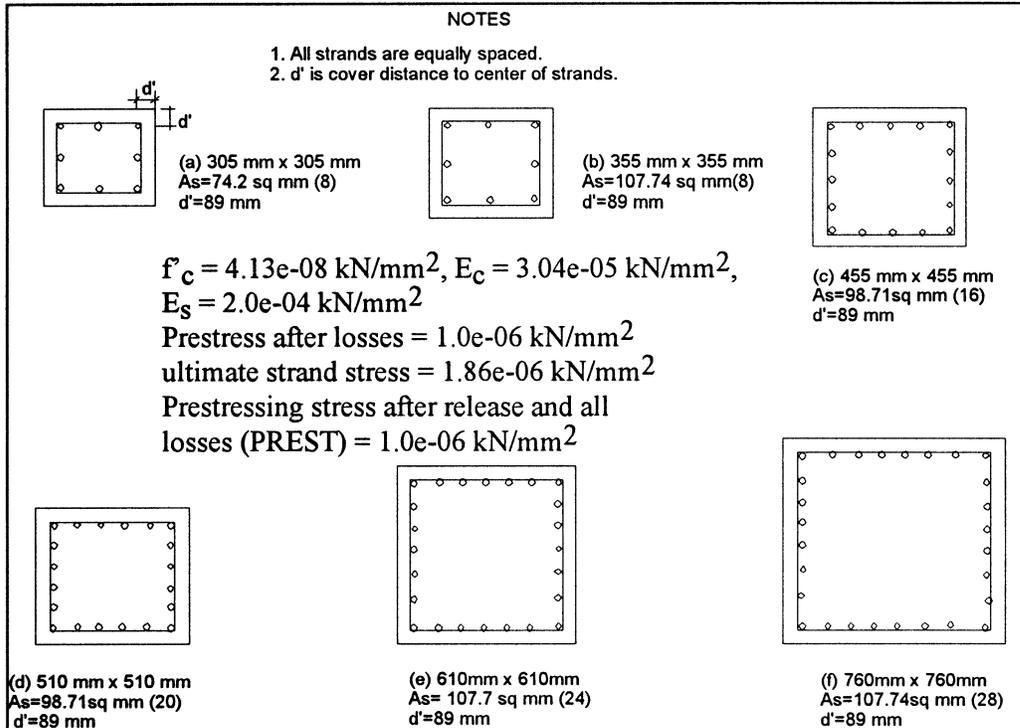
Standard FDOT Prestressed Concrete Pile Sections (millimeters, kN)
